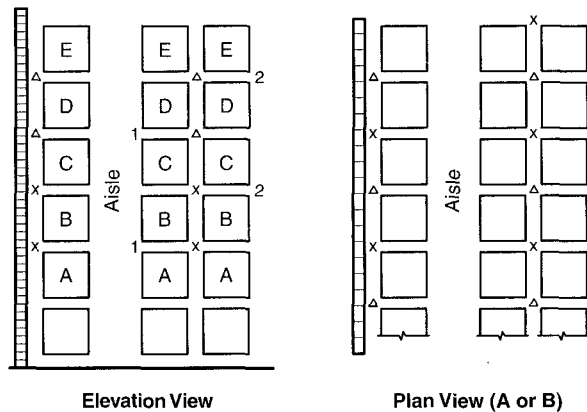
(a) In-rack sprinkler arrangement, Class I commodities, storage height 25 ft to maximum 30 ft (7.6 m to maximum 9.1 m).
